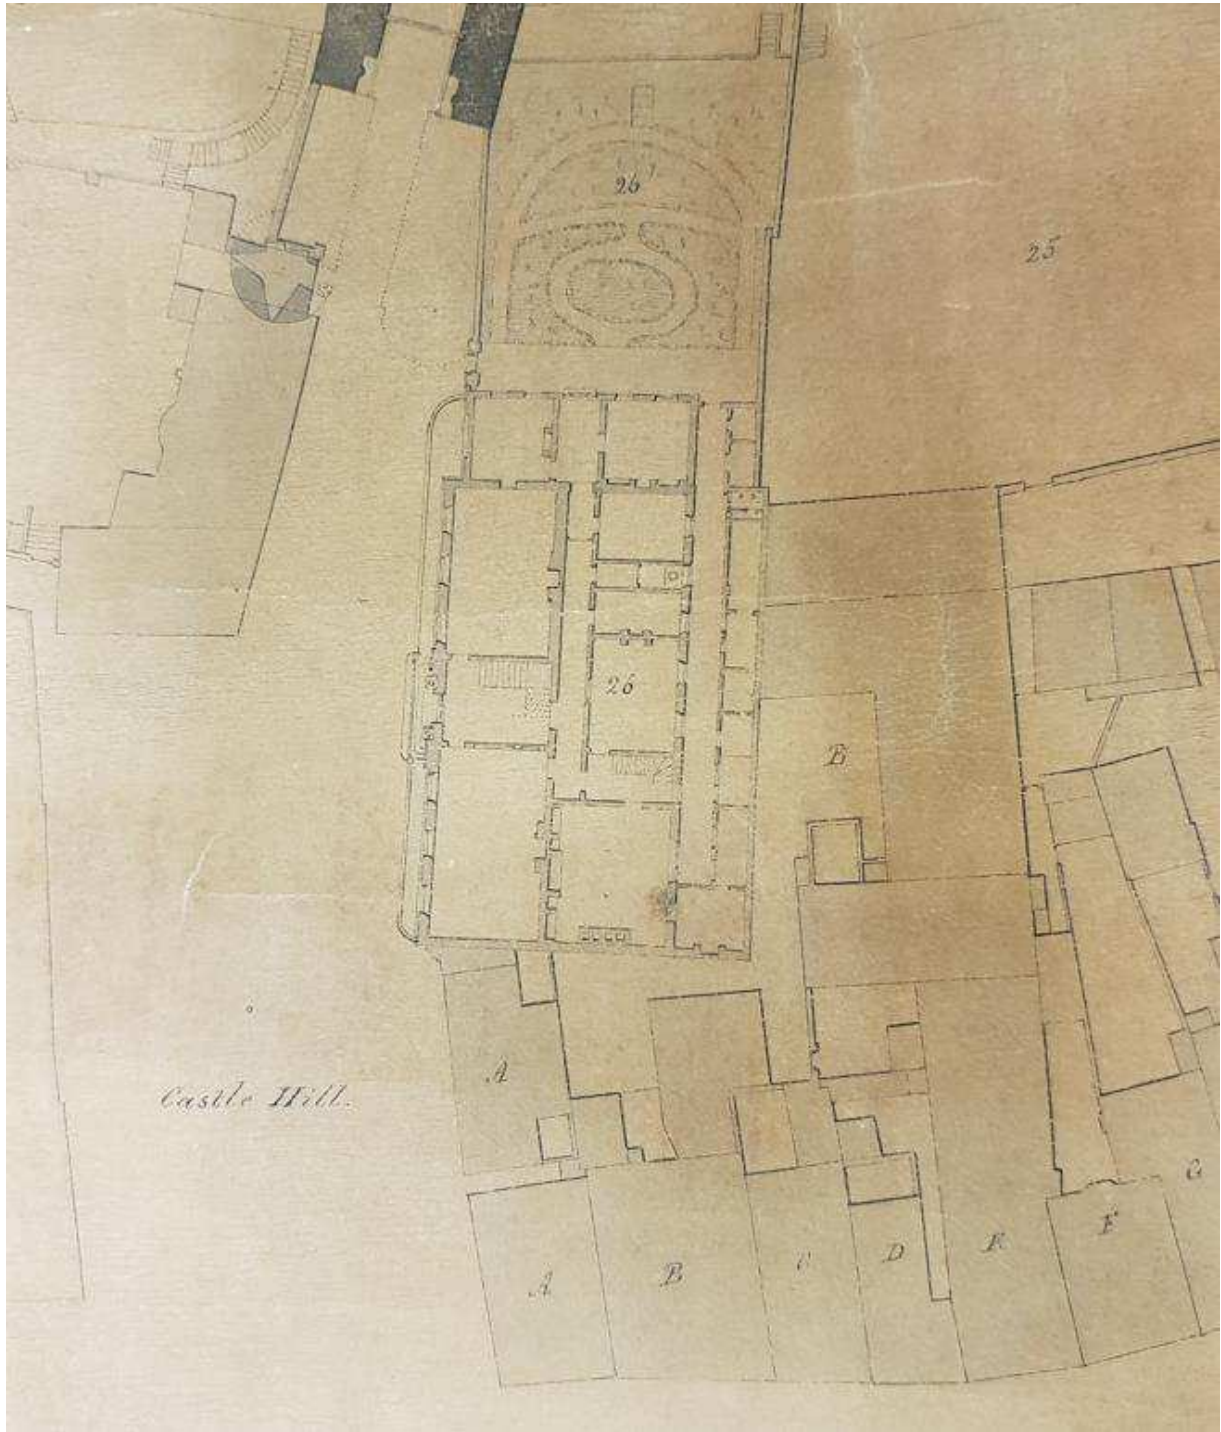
Extract from the 1832 'A Plan of Lincoln Castle with the Premises Adjoining' by T J Willson. Leigh-Pemberton House was annotated as 'A' on the corner on this plan.²²
